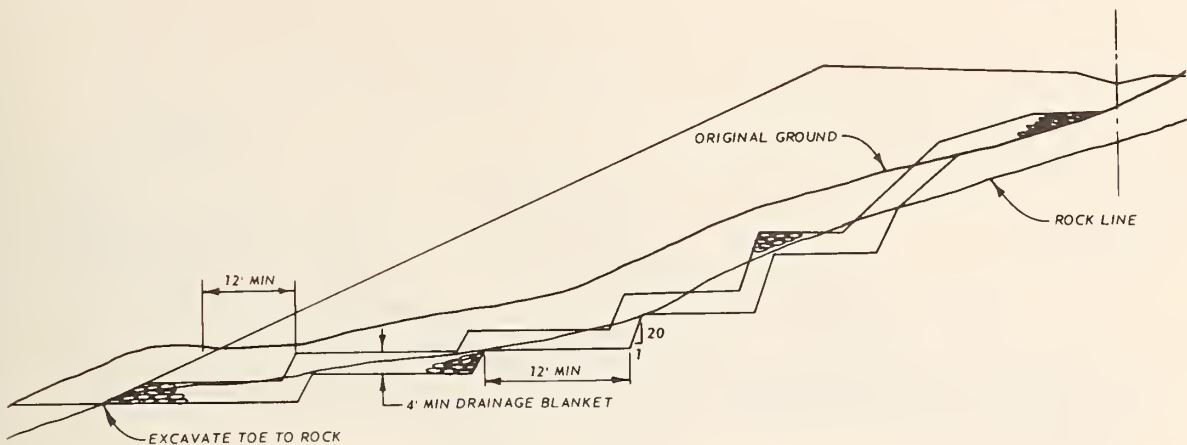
Bench design with rock drainage (courtesy West Virginia Department of Highways)
